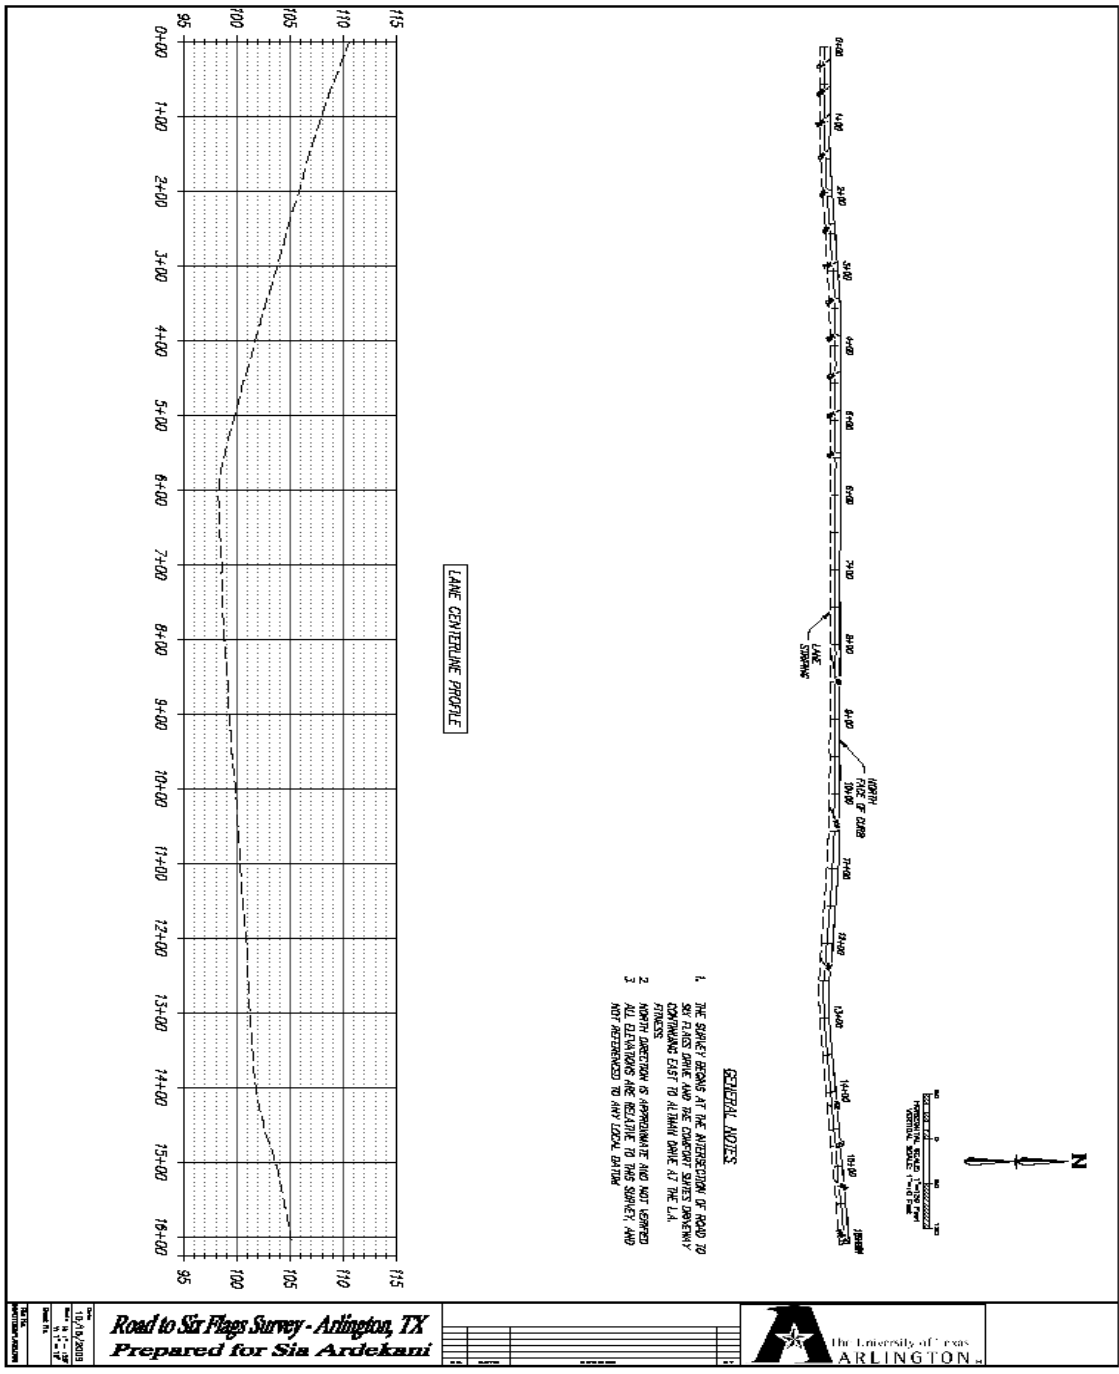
Longitudinal Grade for Road to Six Flags Street (PCC) in Arlington, TX.
